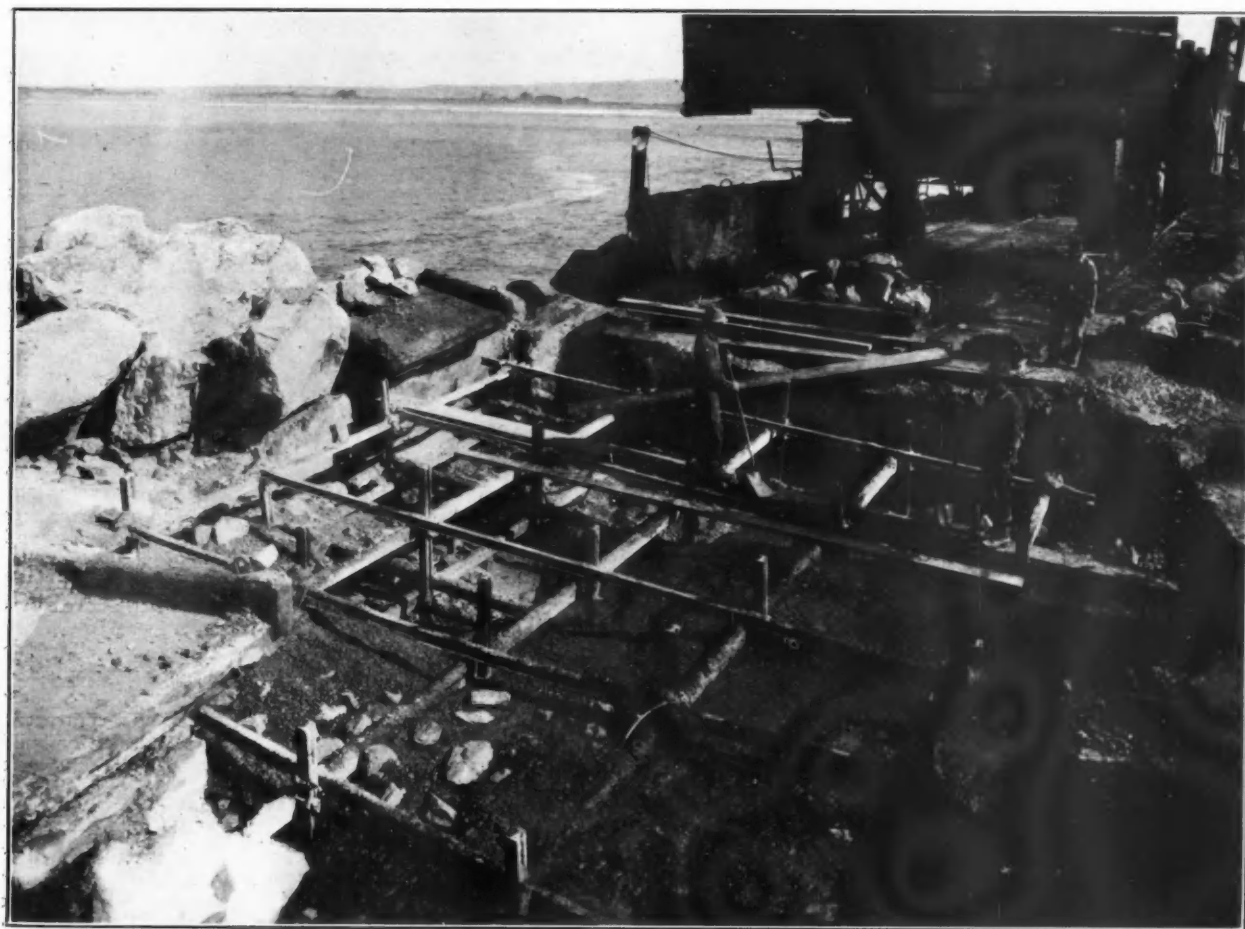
Building Monolith, Outer End of North Jetty. Pit about two-thirds full of concrete. September, 1925.
